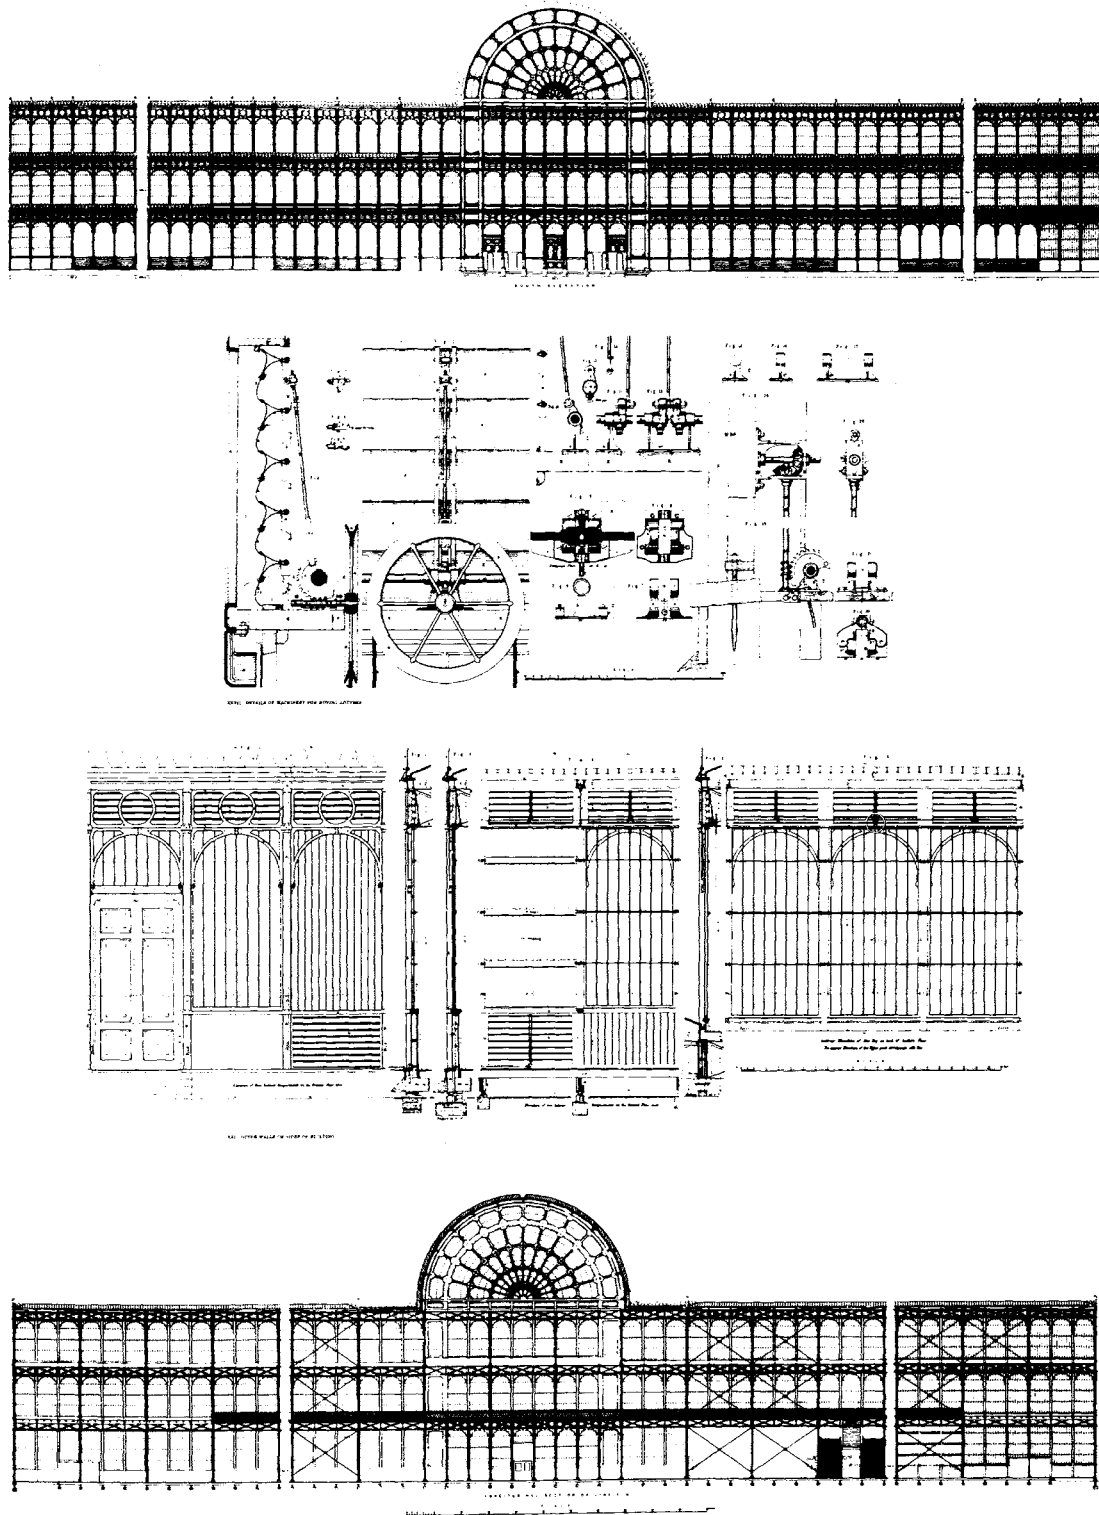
Crystal Palace elevations, sections and details, Hyde Park, London 1851 (designer Joseph Paxton).
